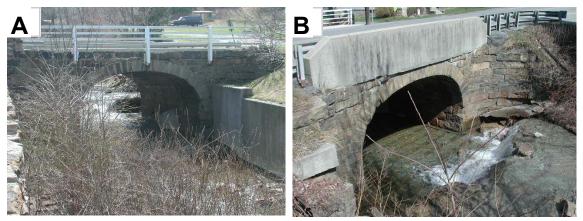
Photographs of the Lilly Culvert, a bridge built for the Alleghenv Portage Railroad in 1832. A - North side. B - South side.
